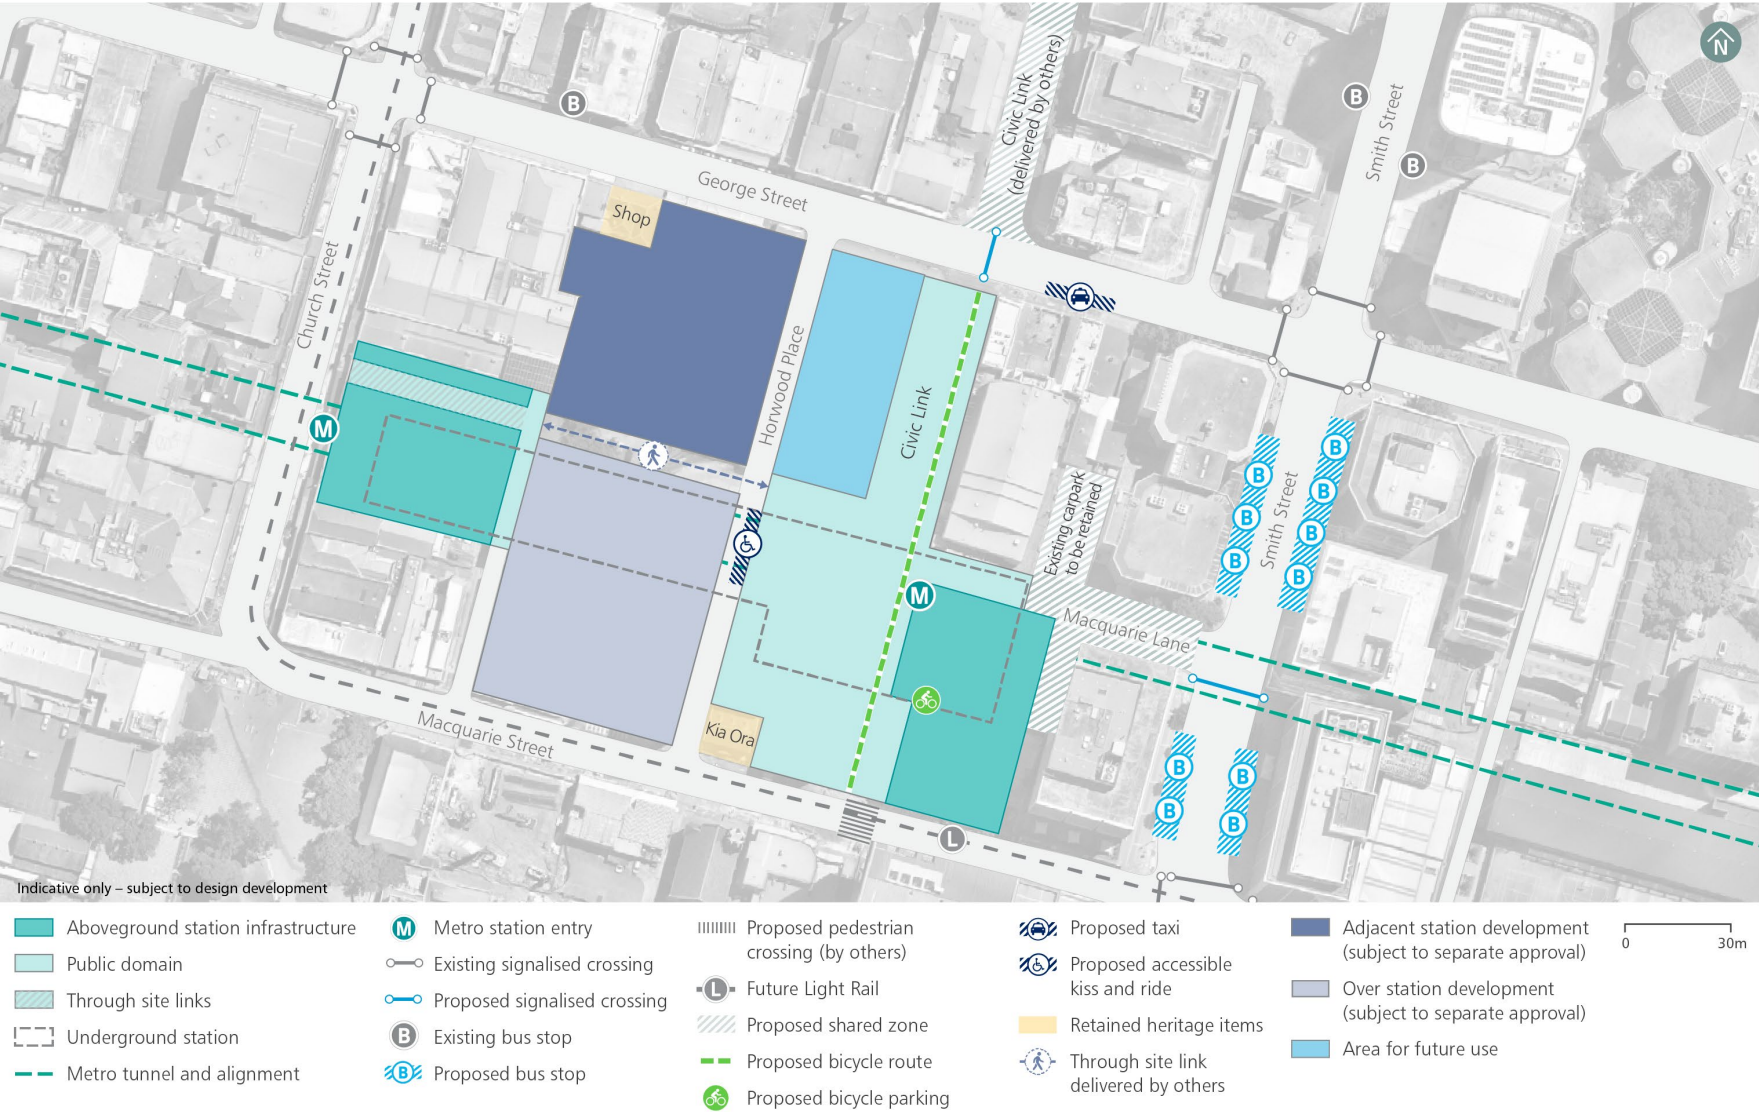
Indicative layout and key design elements – Parramatta metro station
